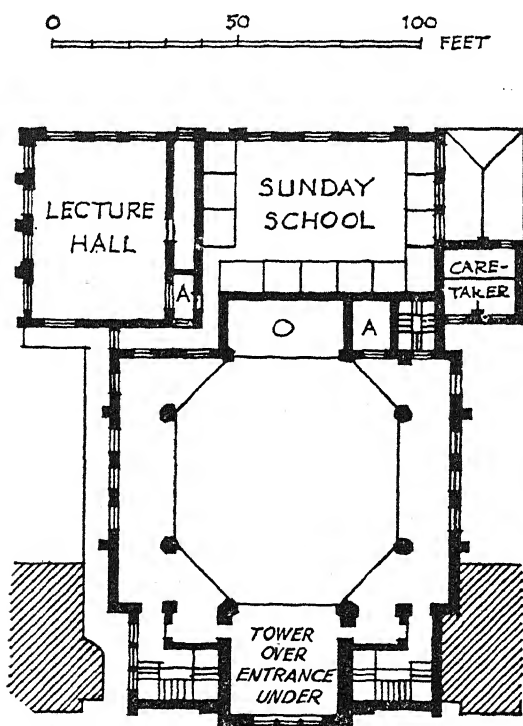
UNION CHAPEL, ISLINGTON: PLAN AT GALLERY LEVEL.
